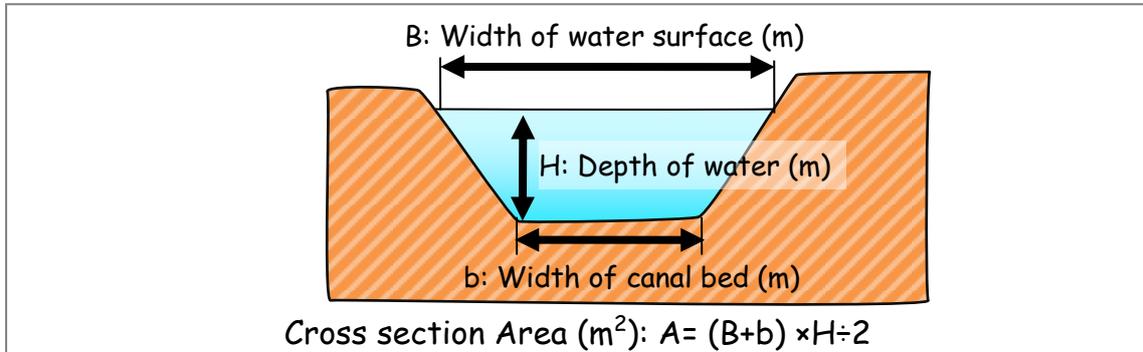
Measurement of cross section area in case of trapezoid cross section
